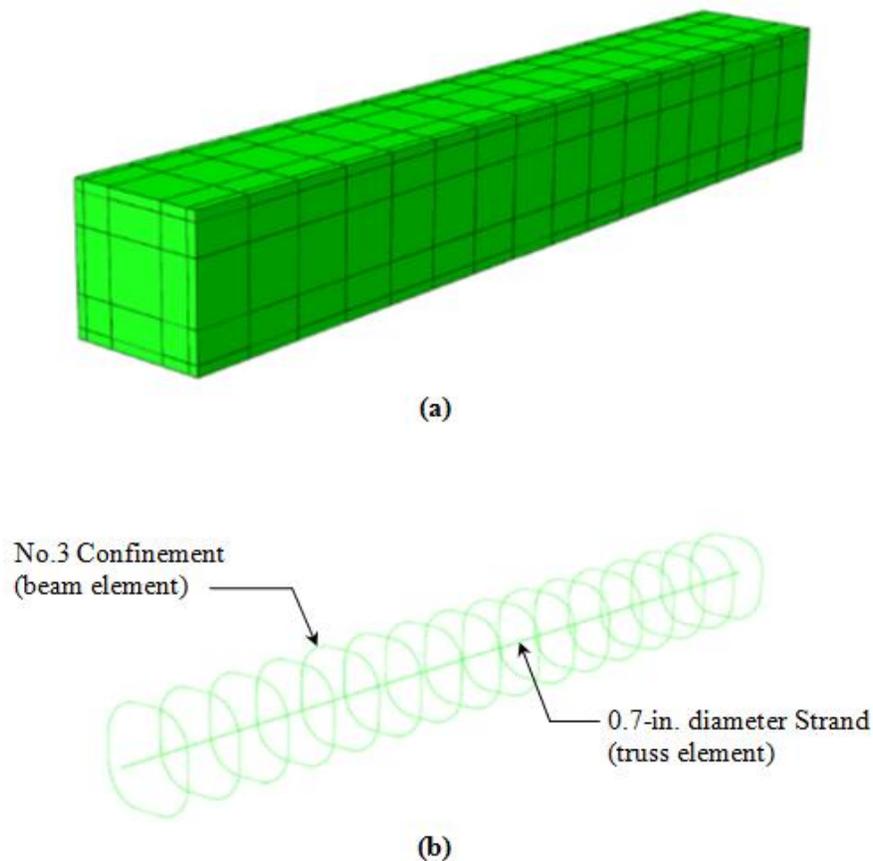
Typical finite element model with one embedded pretensioned strand and embedded ties: (a) Concrete beam modeled as continuum elements, and (b) strands and ties modeled as truss and beam elements, respectively
